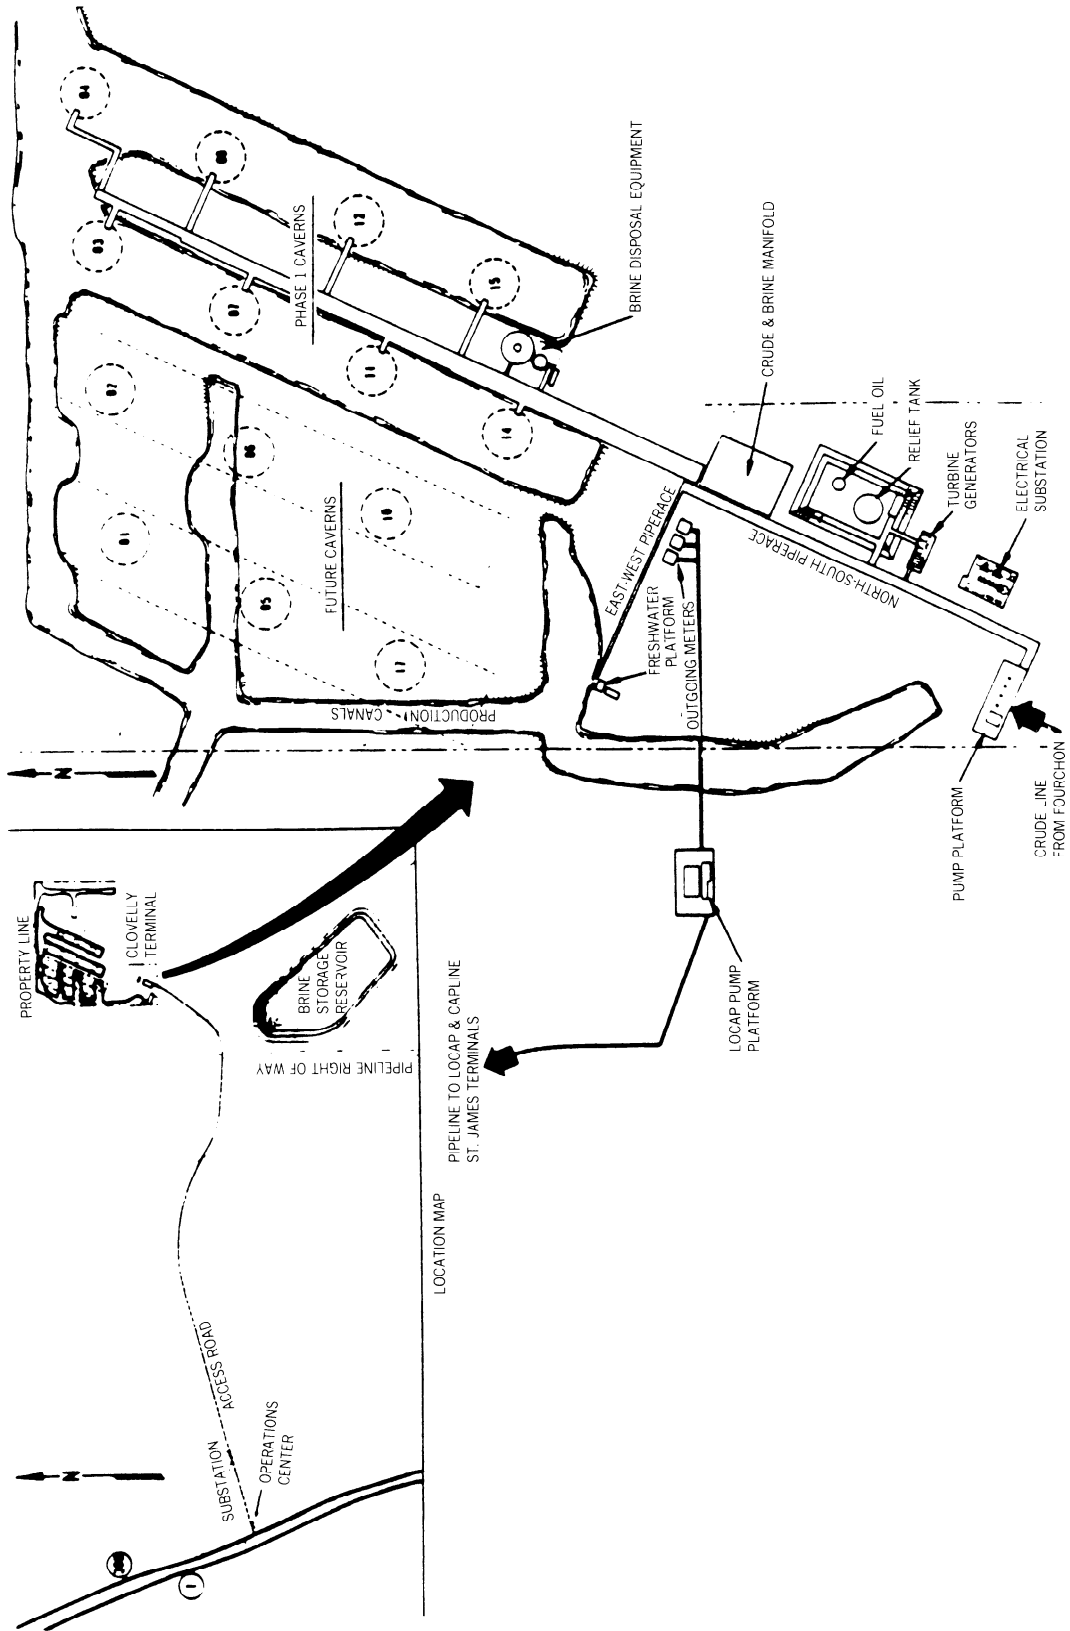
Plan view of Clovelly terminal, Louisiana (by permission: Walk, Hydell & Associates, Inc.).
